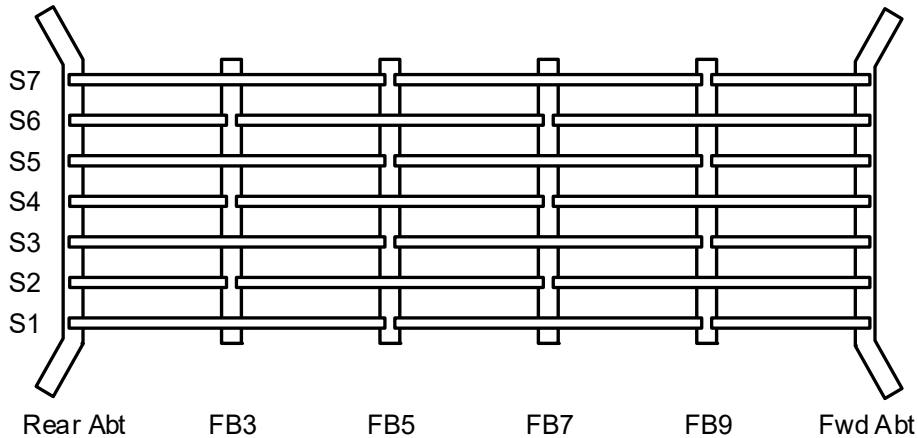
Stringers Detailed to be Continuous over One Intermediate Floor Beam
